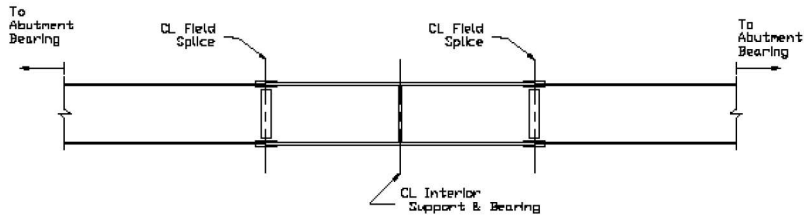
Conventional two-span continuous bridge girder (Azizinamini 2014).
